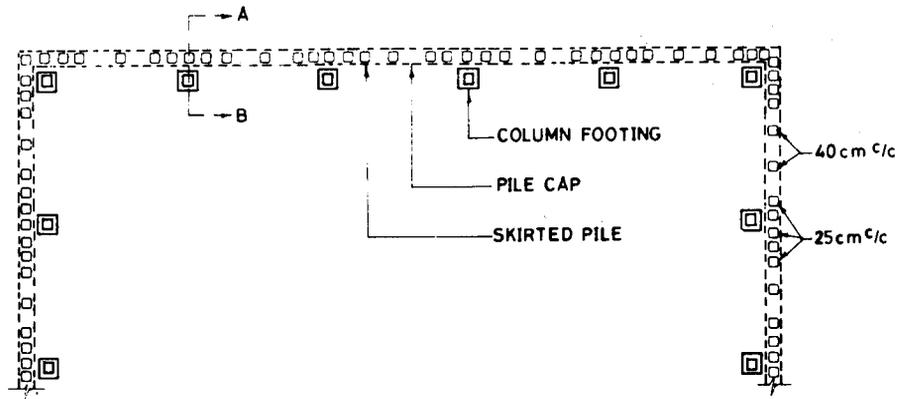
(a): PLAN SHOWING THE LAY-OUT OF R.C.C. SKIRT
